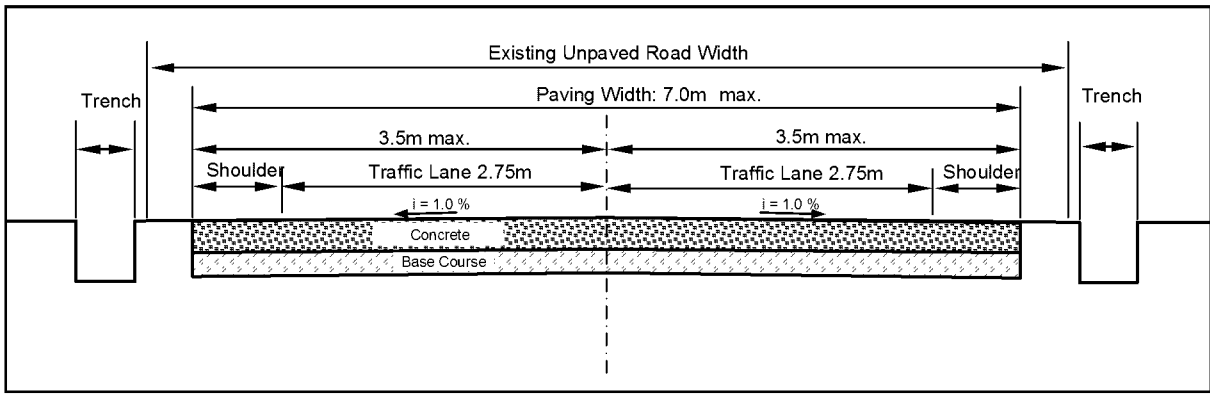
Standard Cross Section of Access Road
